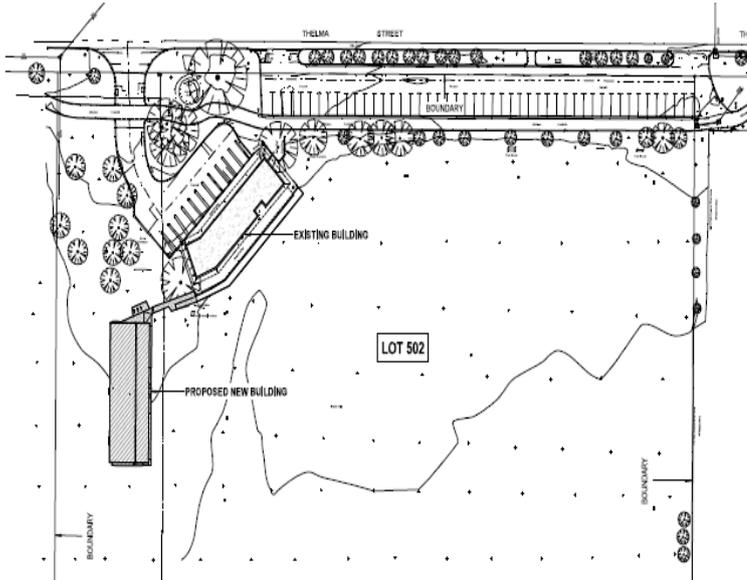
Site Plan of Collier Reserve indicating location of proposed new changeroom building in relation to existing changeroom building.
